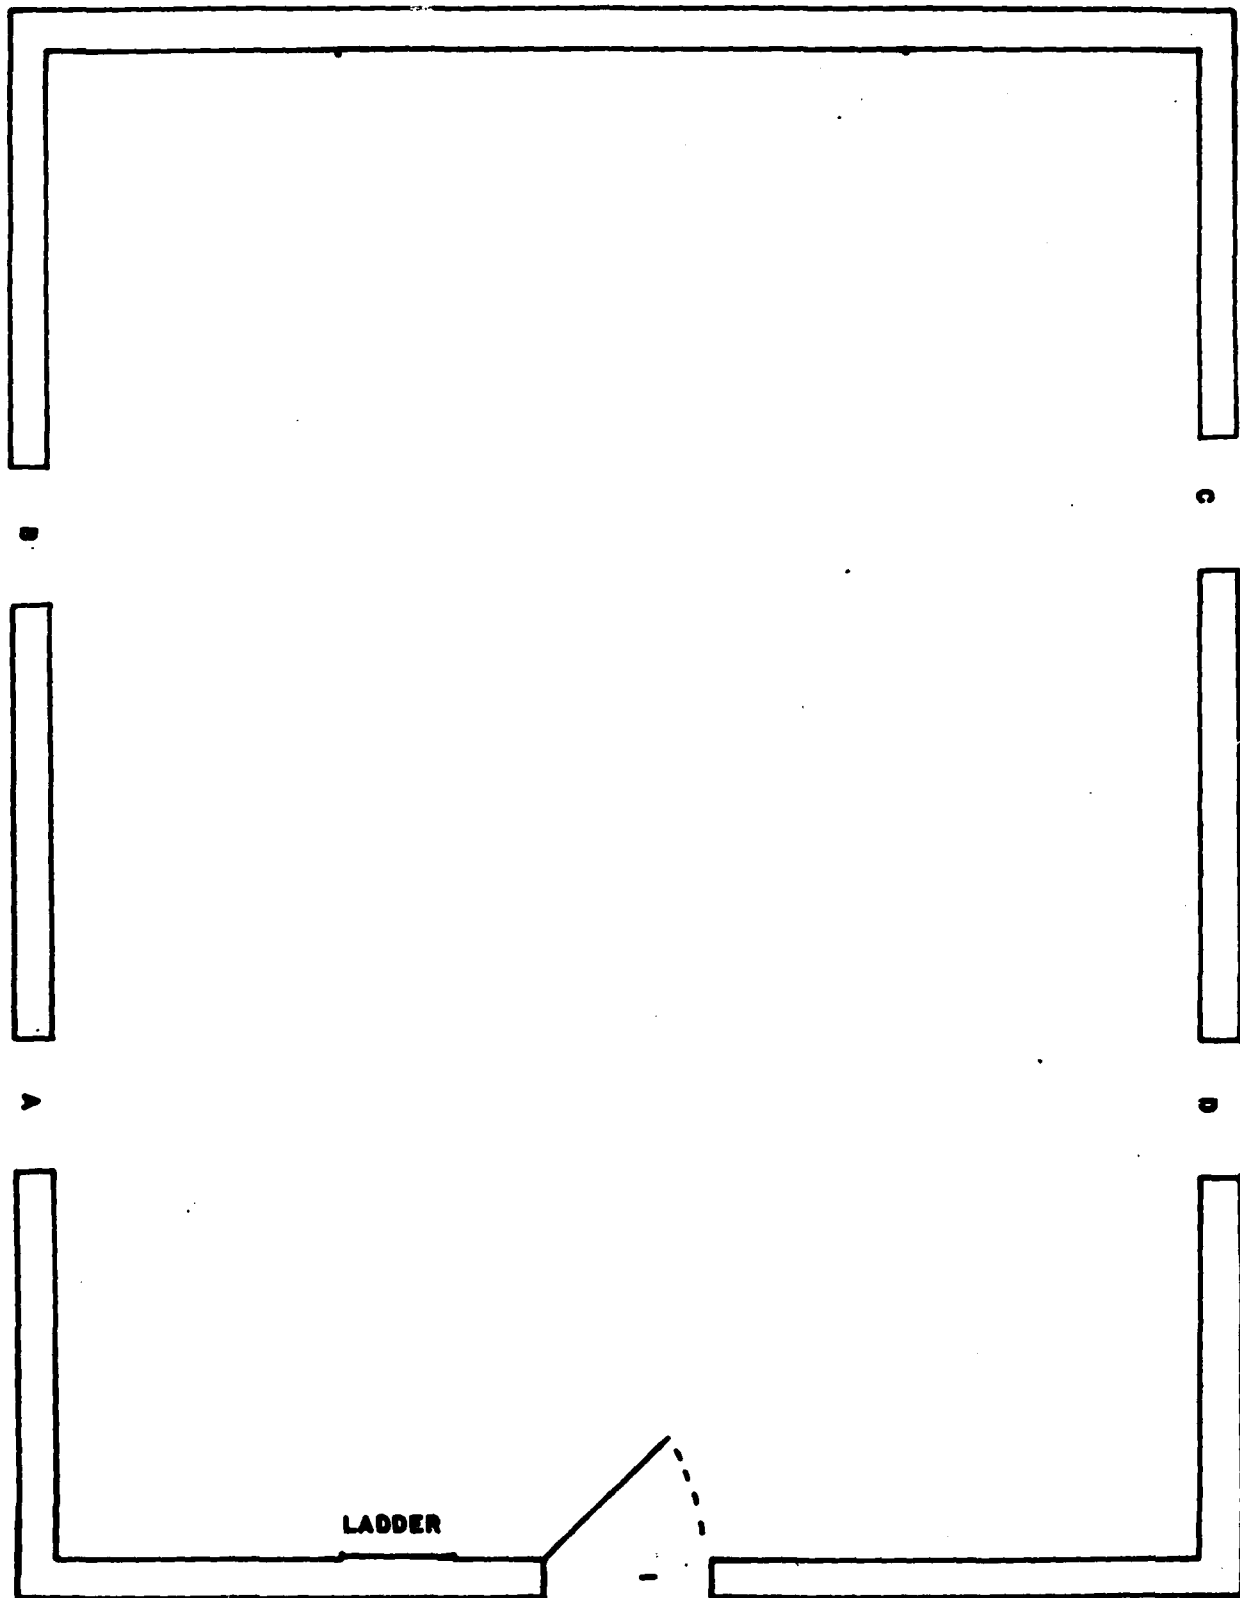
Floor plan of the McKenzie Branch school as reconstructed adjacent to Johnson Central High School, Paintsville, Kentucky.
